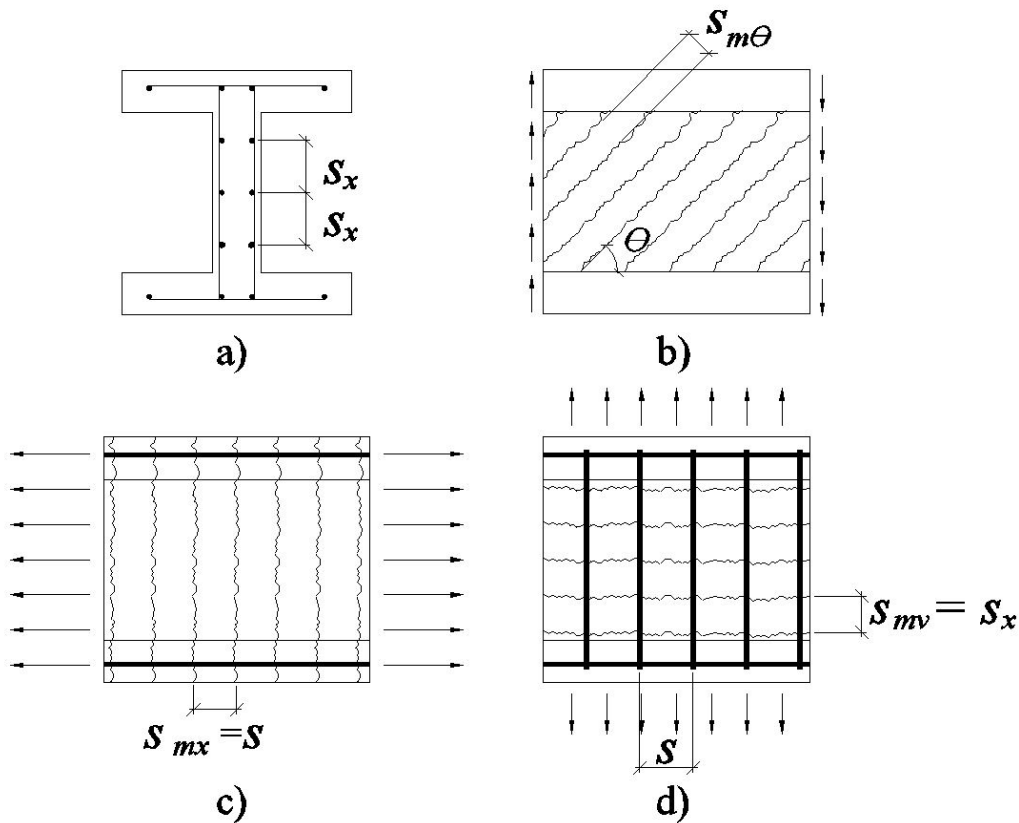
Definitions of spacing; a) cross section and spacing between horizontal bars in the web, b) spacing between inclined cracks, c) spacing between vertical cracks (due to axial tension), and d) spacing between horizontal cracks (due to transverse tension) and stirrups.
